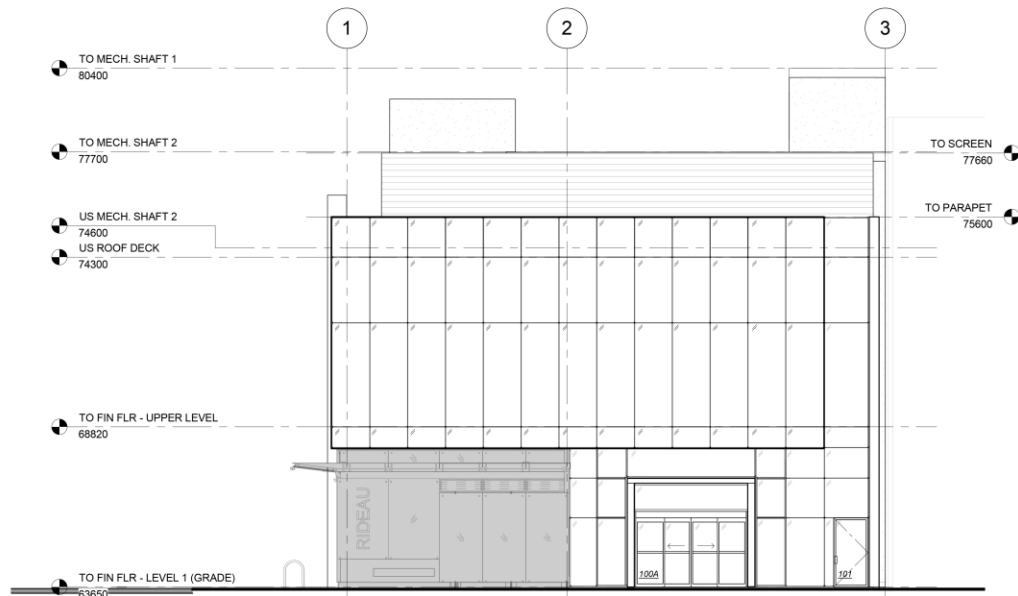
West elevation of proposed infill building at 117 Rideau St. (IBI Group, 2016)
